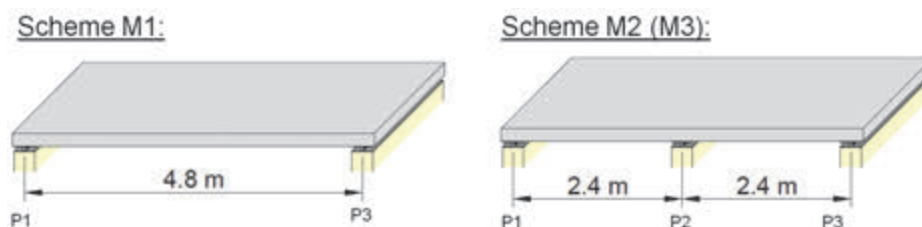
Test arrangements - scheme M1, M2 (M3)
